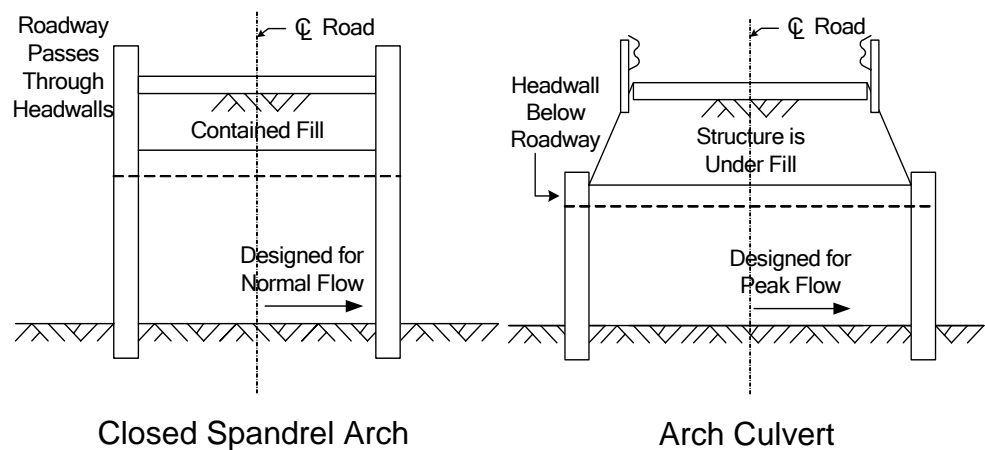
Closed Spandrel Arch versus Arch Culvert
